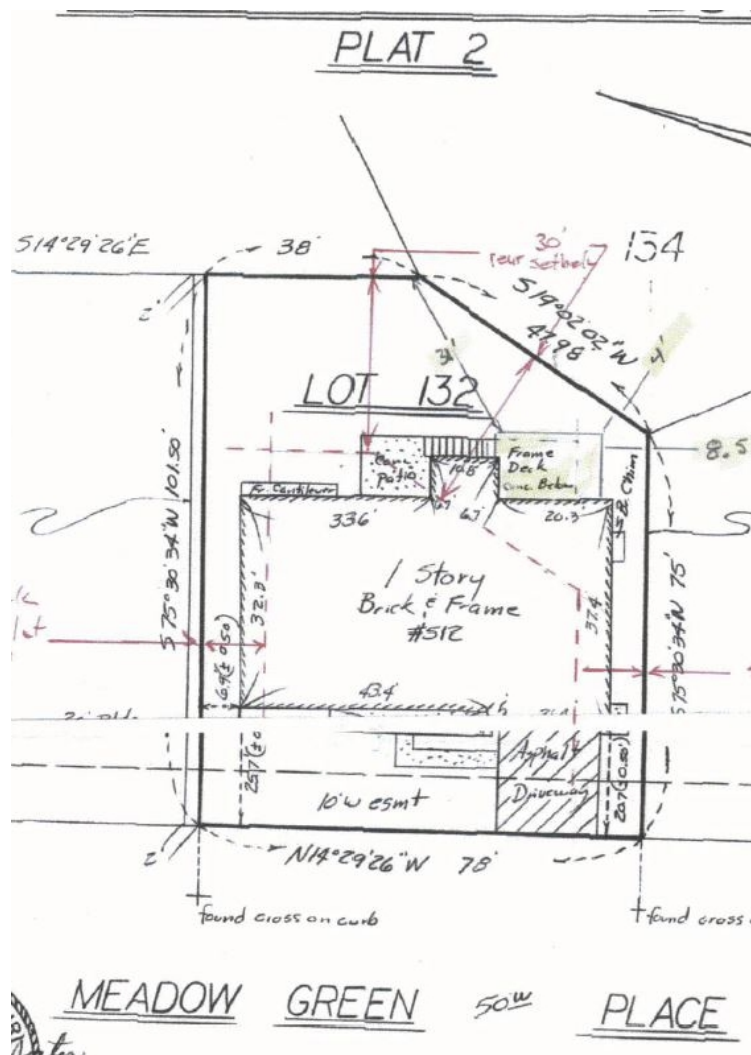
Close-up of the Applicants Site Plan showing the deck.
